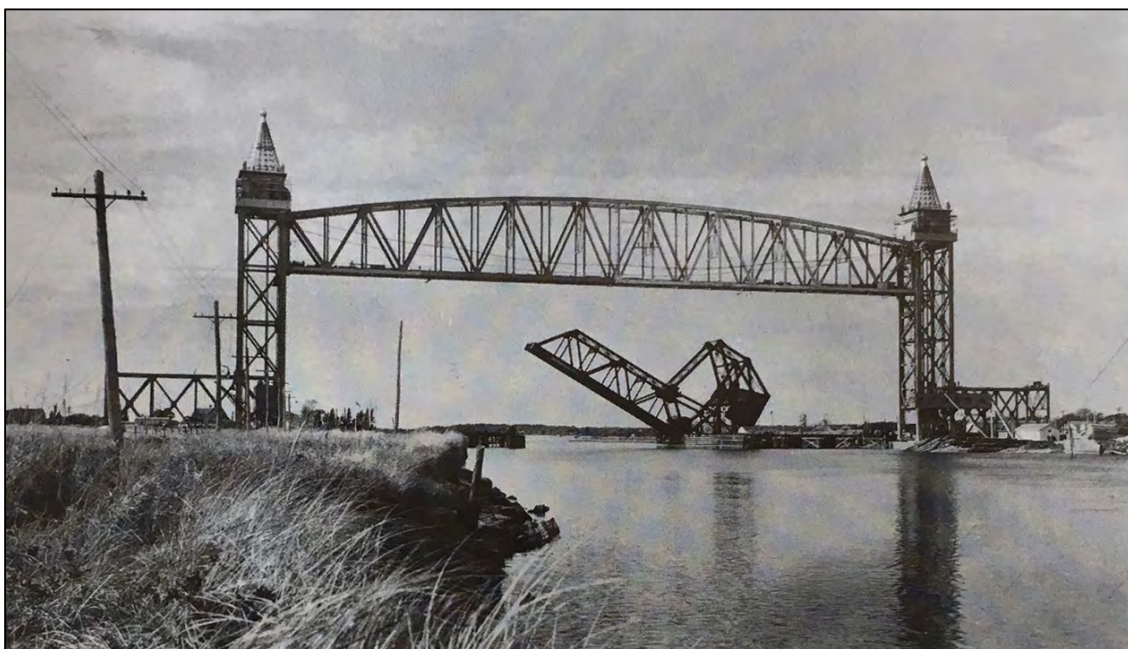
View of the Buzzards Bay Railroad Bridge at completion, 1935 (from Orwig, Cape Cod Canal, page 117).
